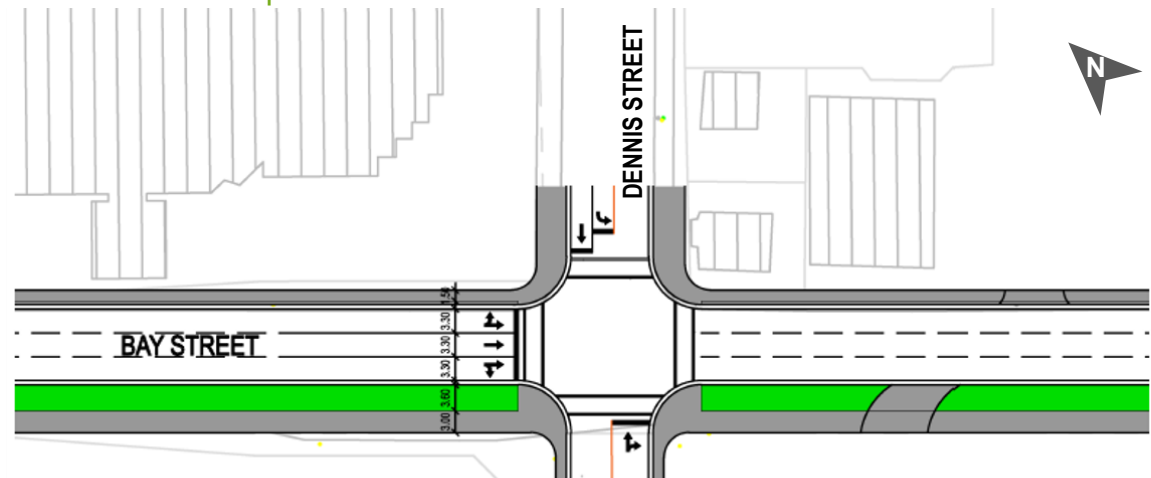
and Exhibit 4.2 illustrate the typical cross-sections and plan view for Alternative 1.
